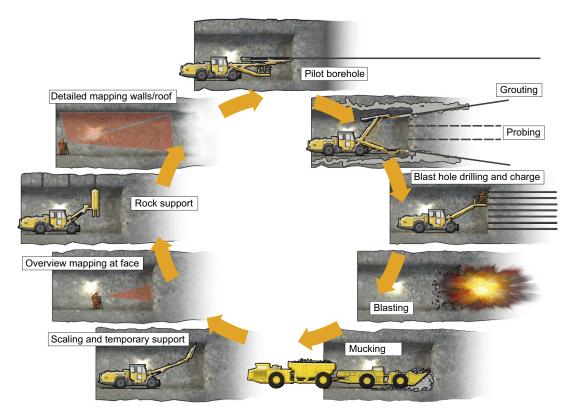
Rock excavation operating cycle for tunnel excavation.
